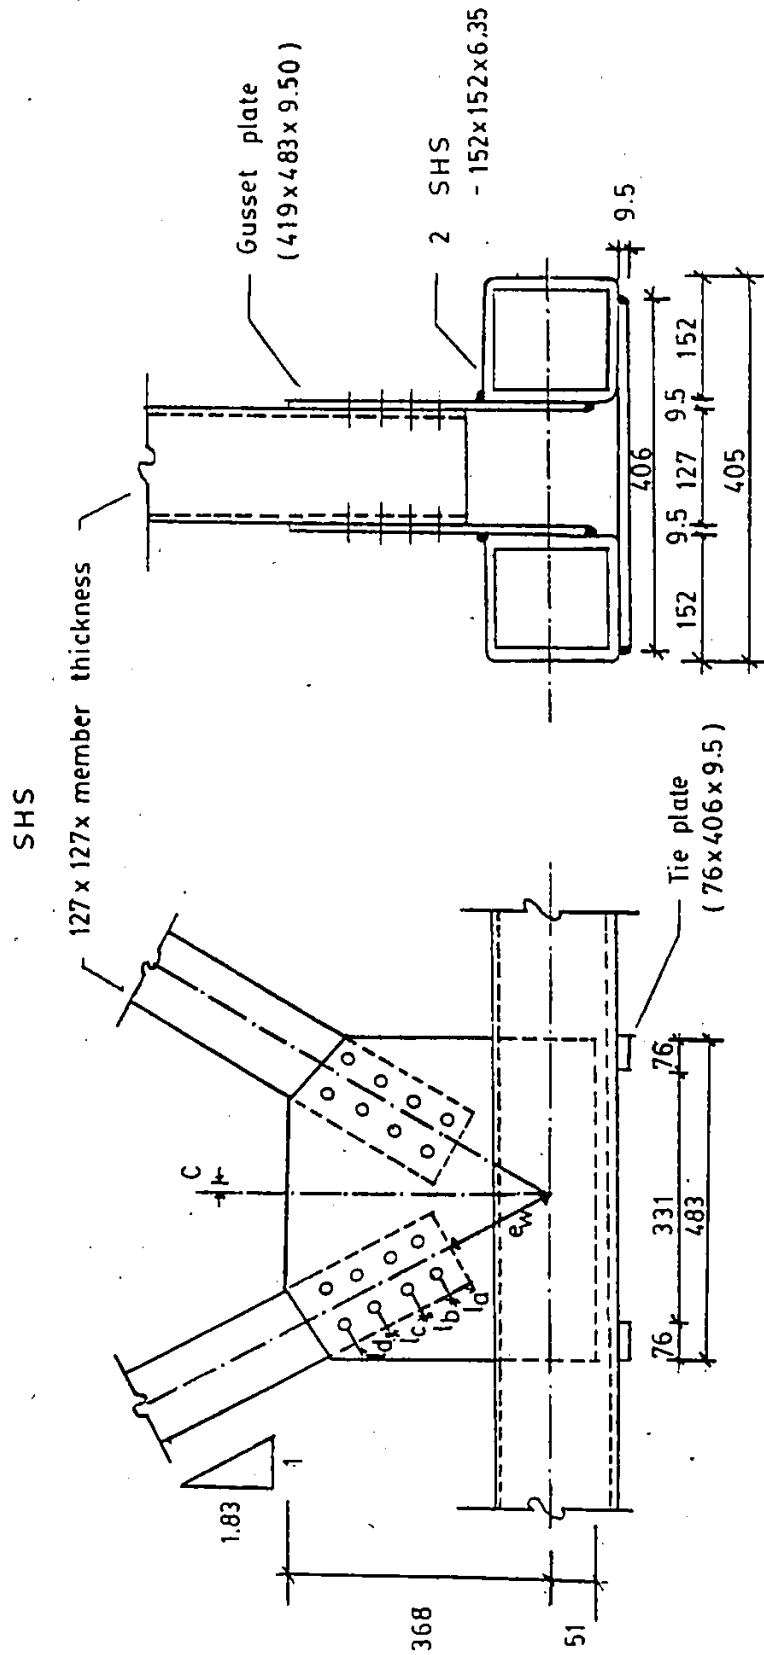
DETAILS OF BOLTED CONNECTION ( Dimensions in mm. )
